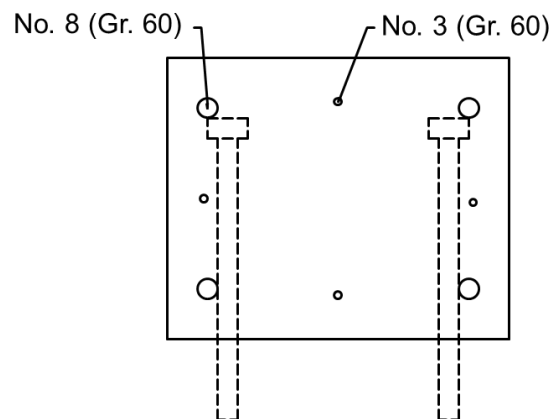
Layout B17: 4 No. 8 + 4 No. 3 (Gr. 60)
